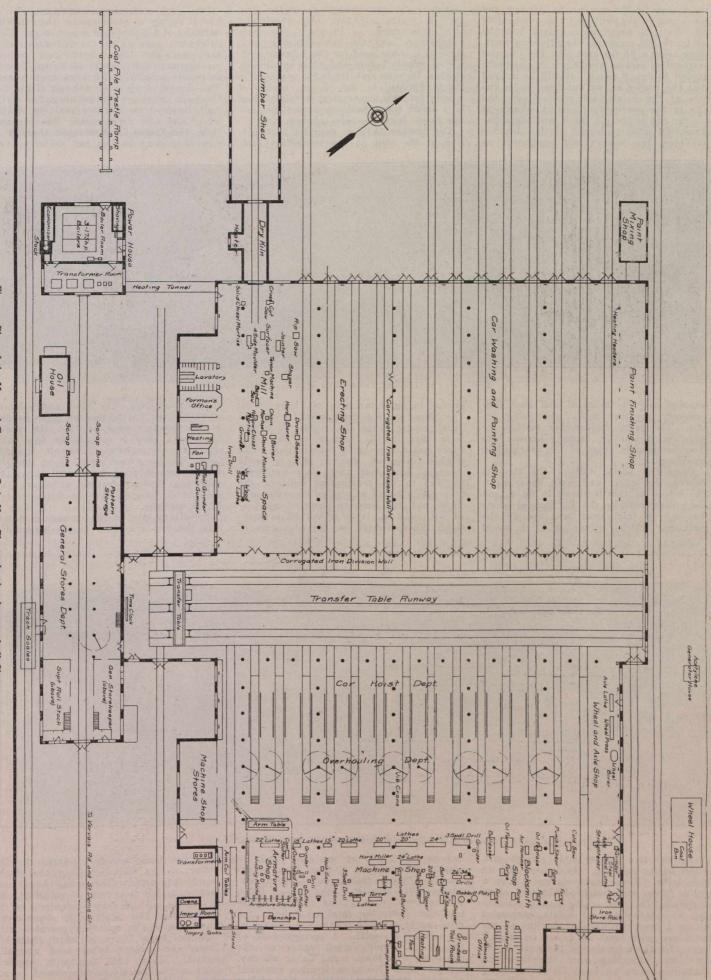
Plan of the Montreal Tramways Co.'s New Plant, showing layout of all Shops.
